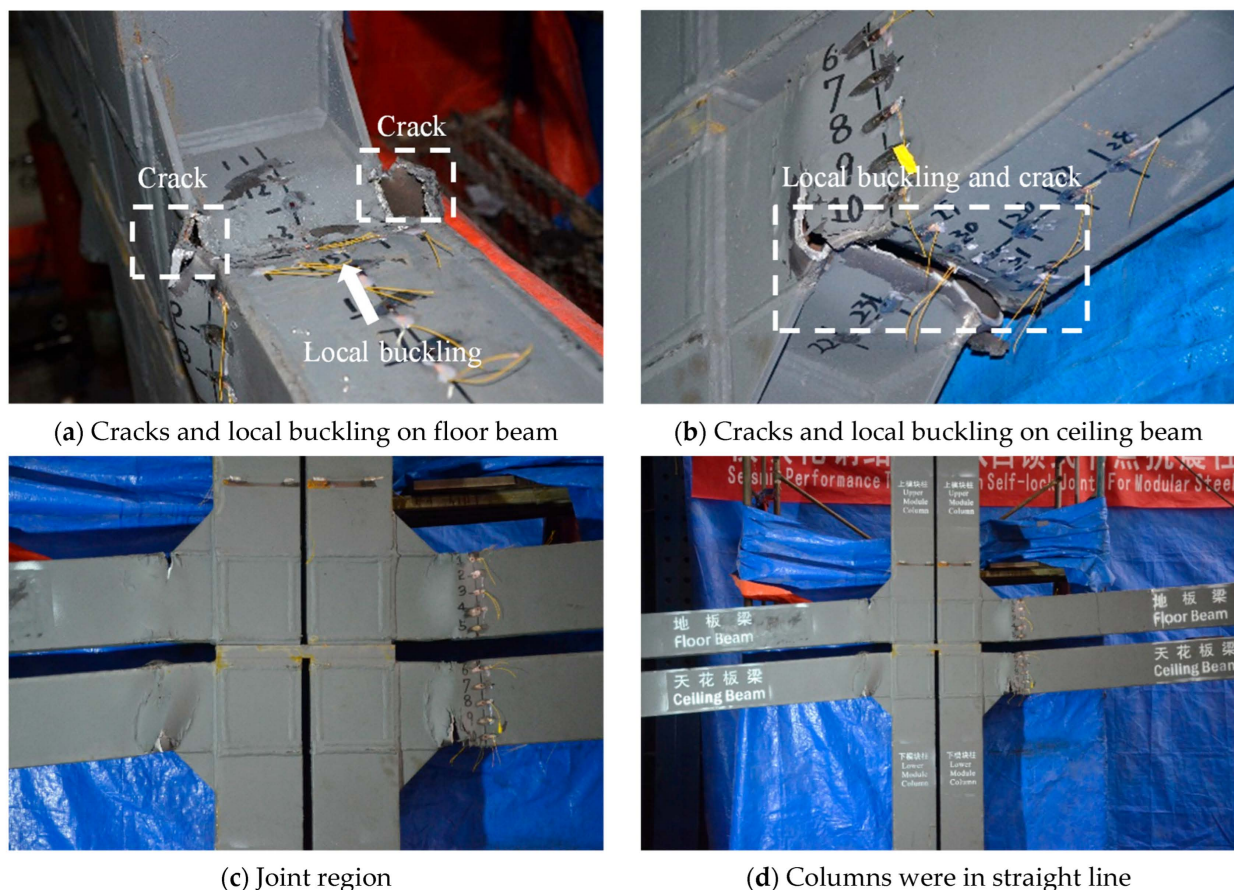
Observations of the Cross-shaped specimens (TS-3 and TS-4).
